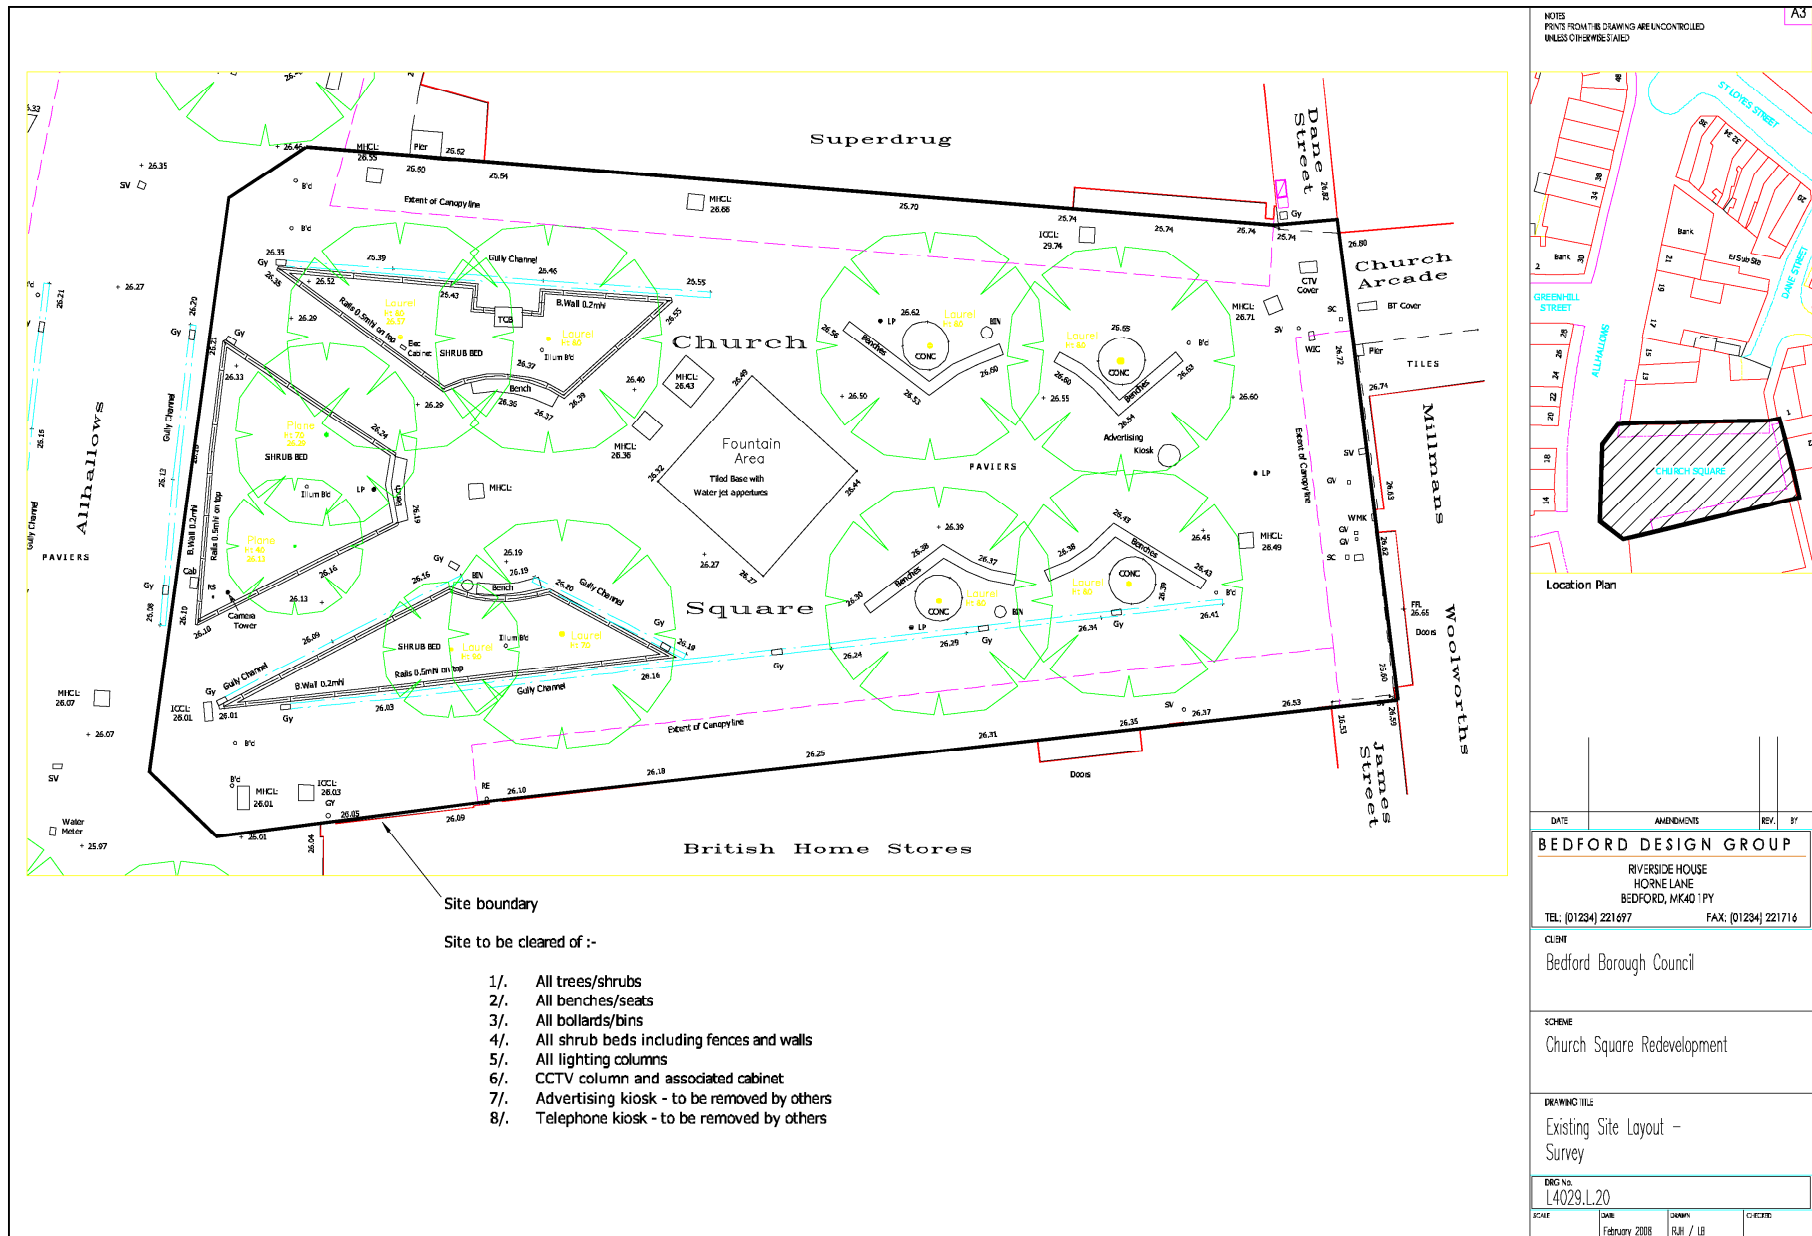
Site layout prior to development. (Drawing by Bedford Design Group. Not to scale)
